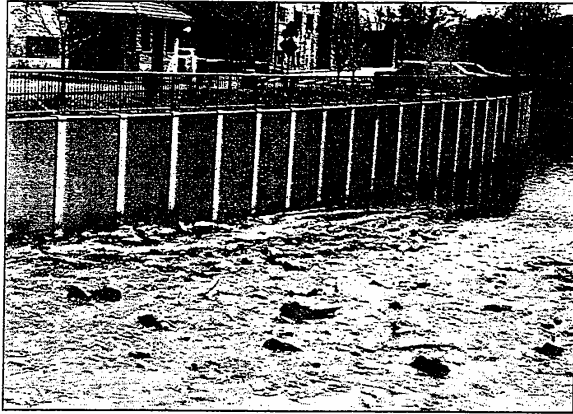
Composite Retaining Wall (Source: CBEL Files)
